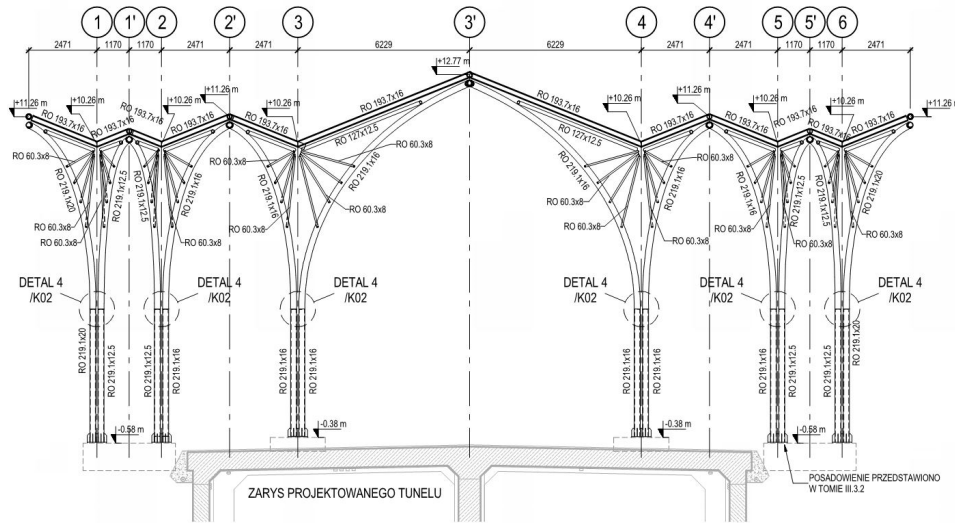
A transverse section through the Piotrskowska Central Tram Station structure (from the Building Permit stage).
